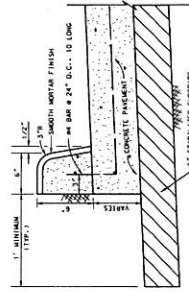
DETAIL JOINT SEAL FOR EXPANSION JOINTS ON PRIVATE PAVEMENT
